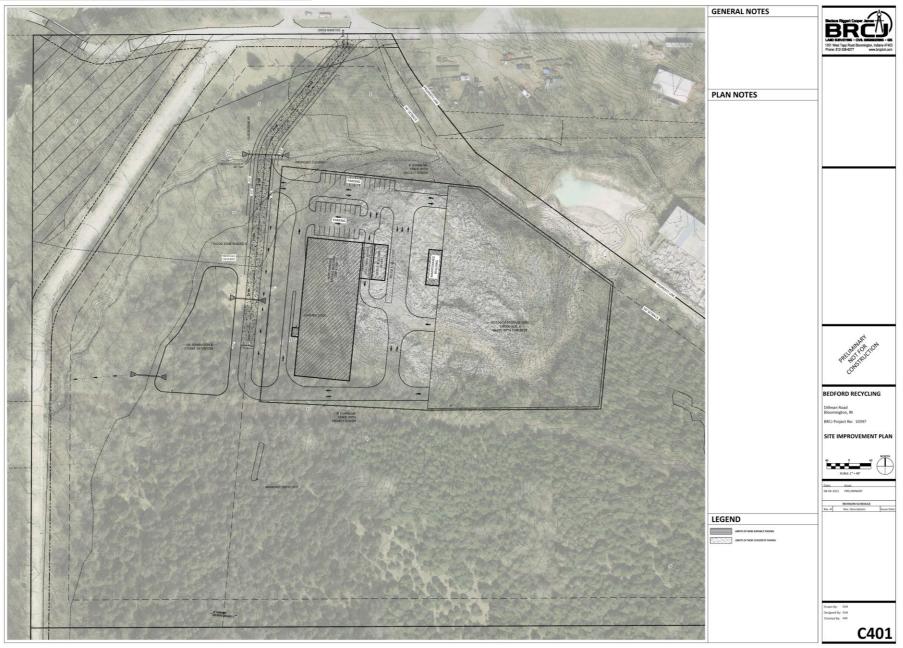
(continued): Overall Site Plan (southern location)
